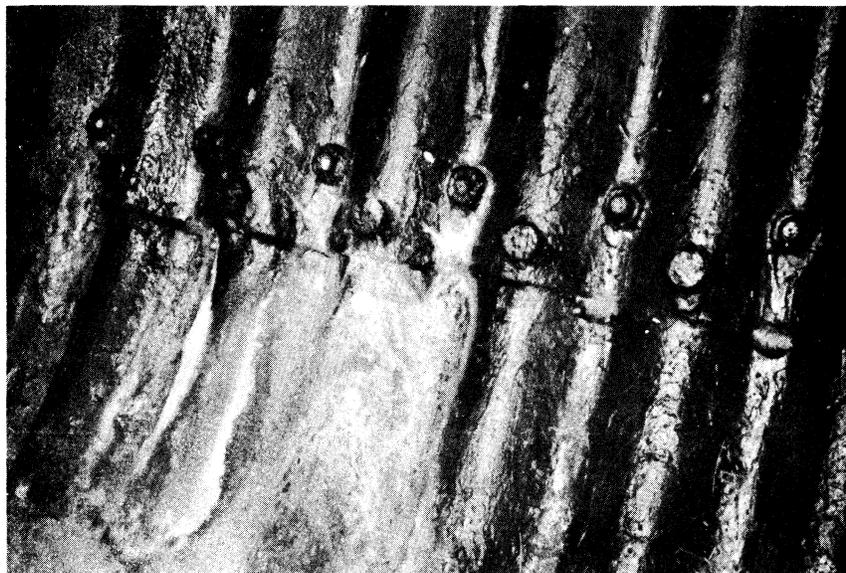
Intrusion of soil through partially open joint between plates coated with asphalt before assembly.
